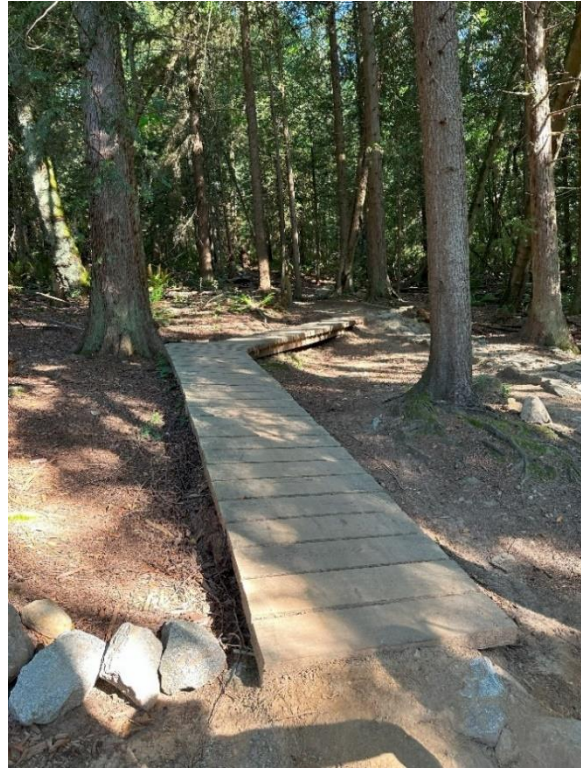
Board walk on trail and rocks placed to divert bike/trail users from unauthorized trails.
